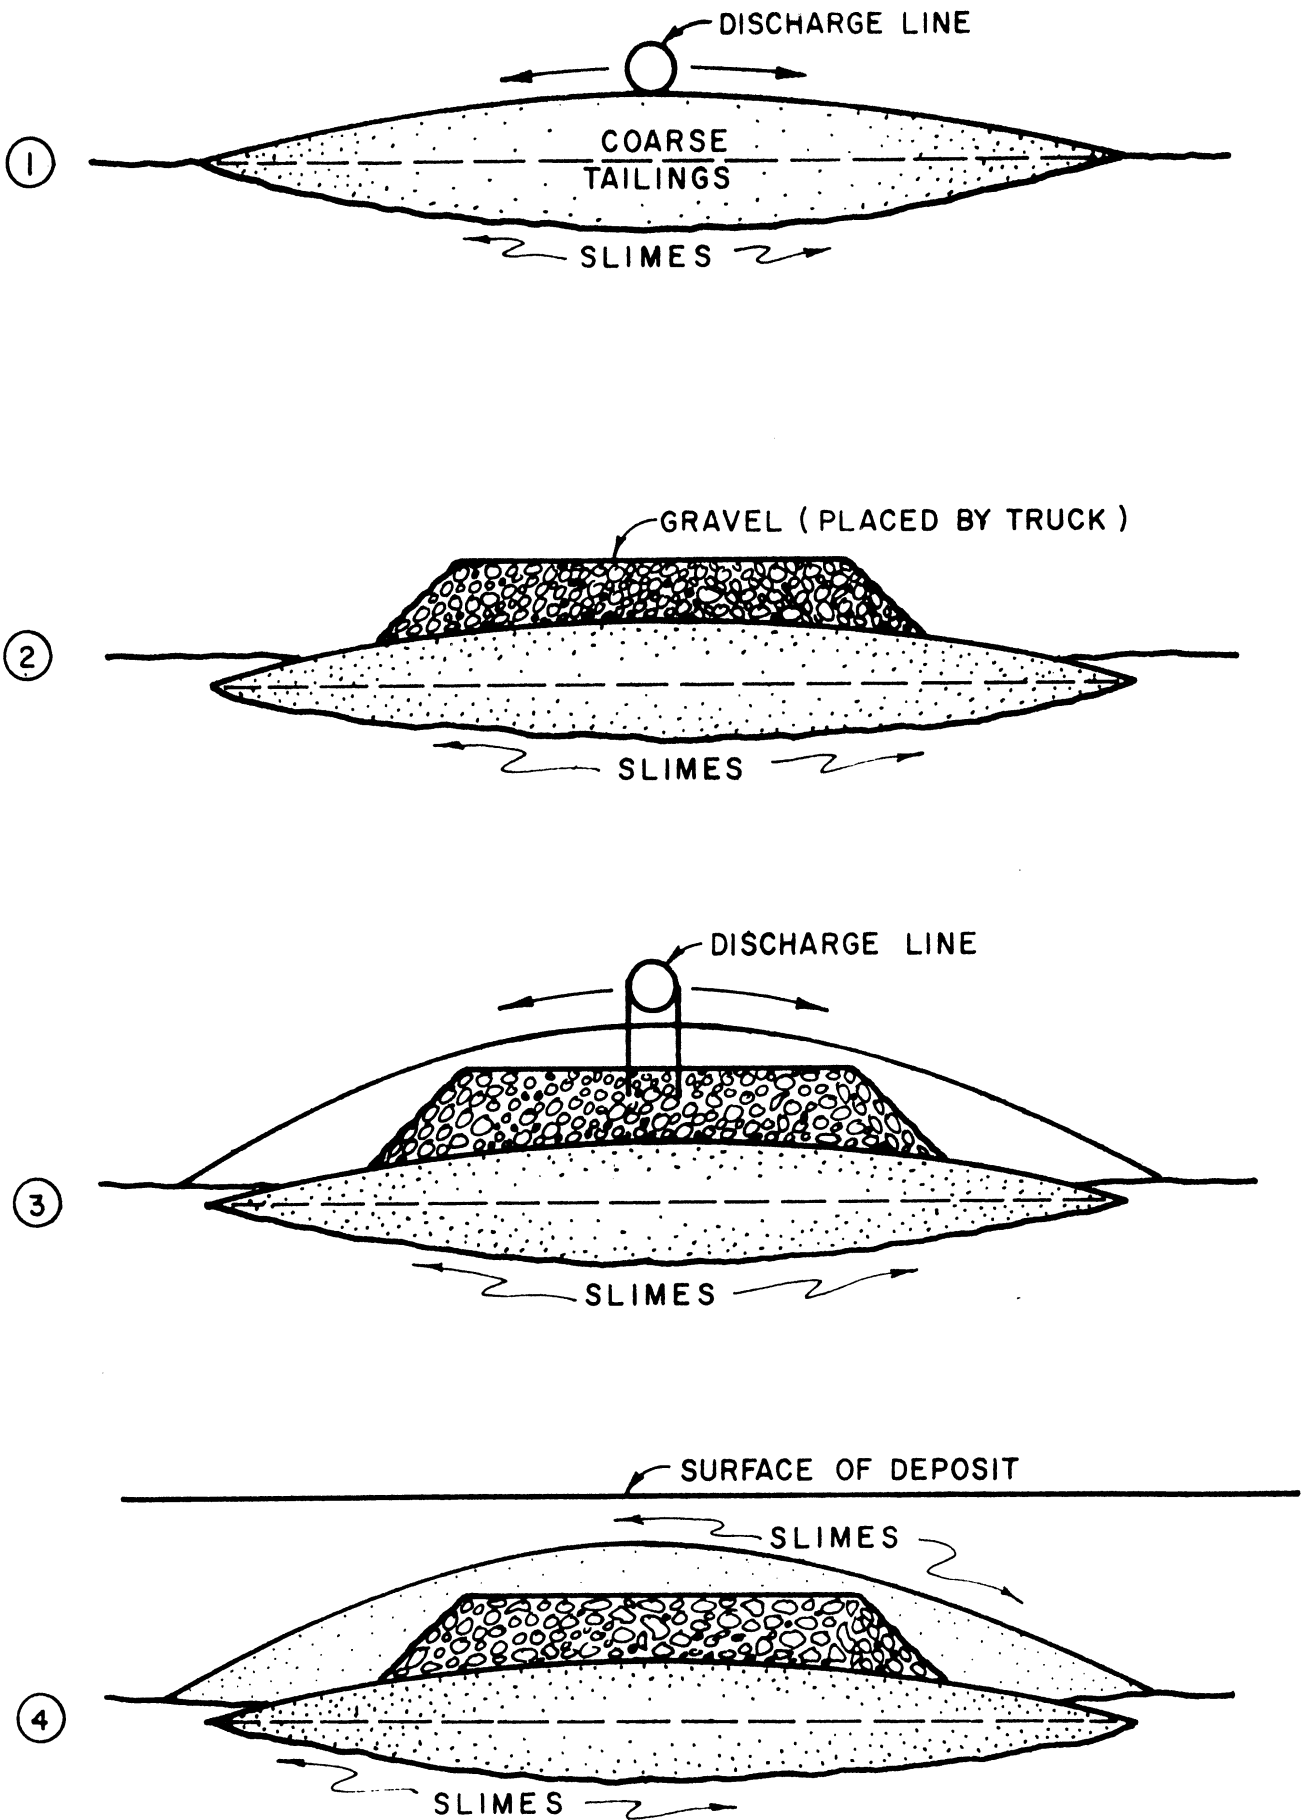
CROSS-SECTION OF ZONED DRAINAGE FINGER (after Smith 1969)
